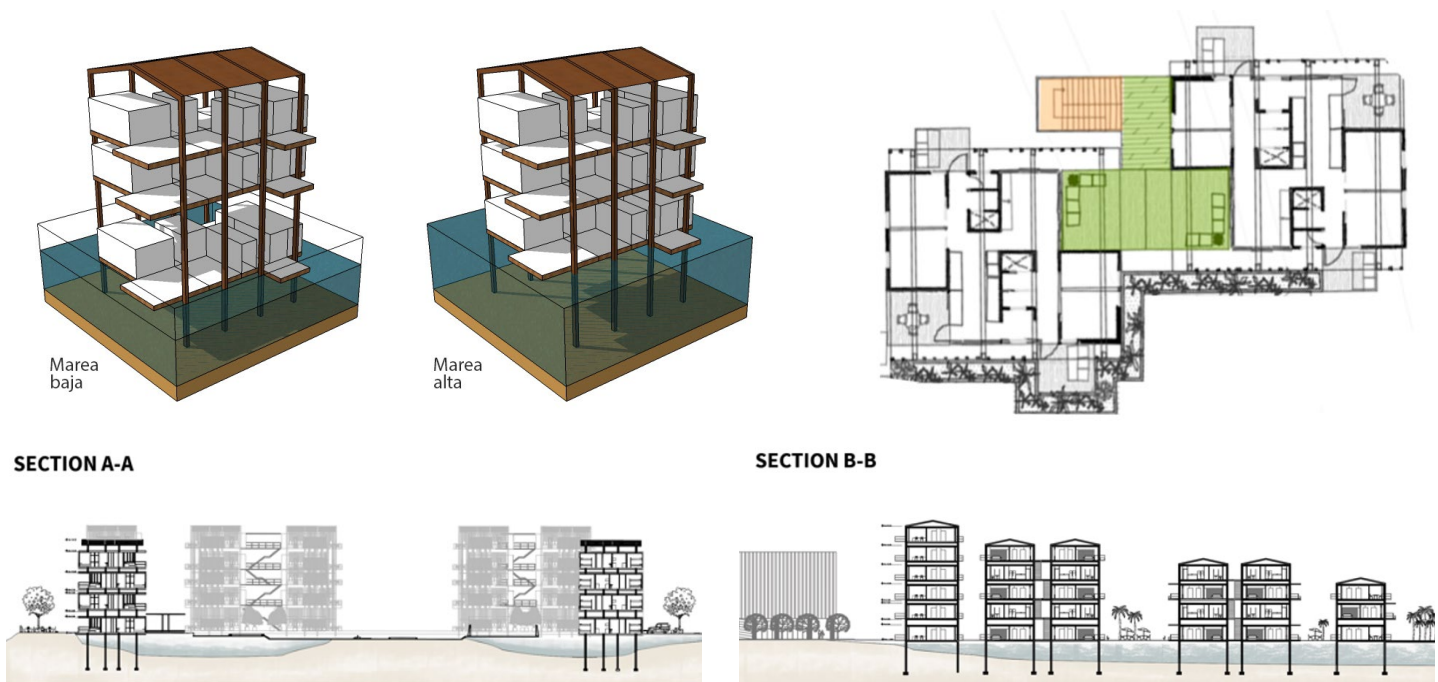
Floatability layout, standard floor plan, and cross section of the dwellings. Source: Prepared by the Authors
